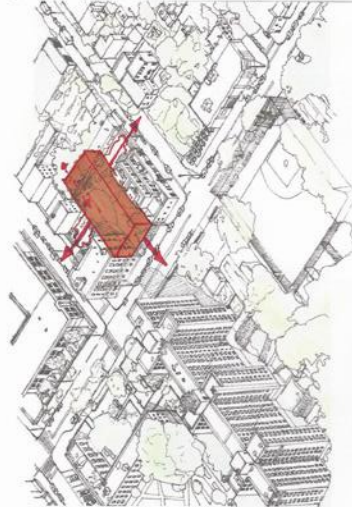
BUILD VOLUME & OPEN SPACE CONFIGURATIONS AT SITE 2 (YMCA-SITE, RICHARDS STREET CENTRAL)
